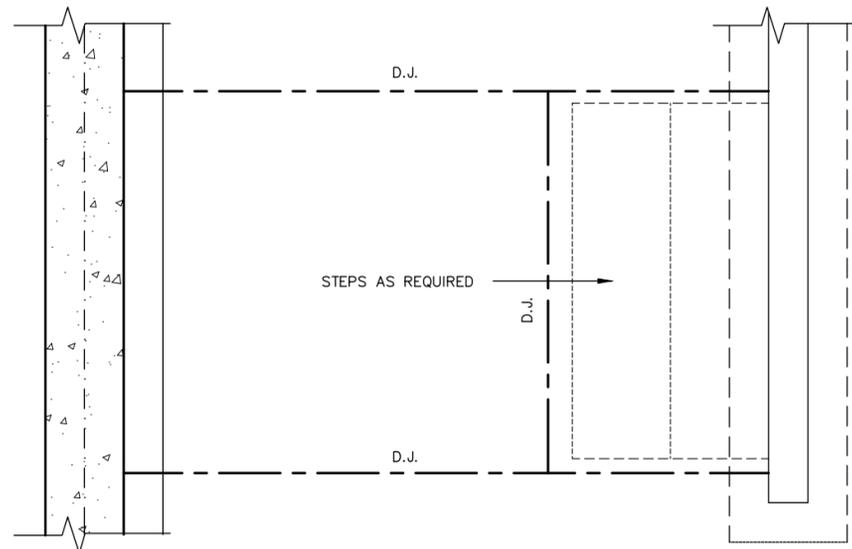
DETAIL OF SUNKEN LAUNDRY/ENTRY (ONE RISER)
